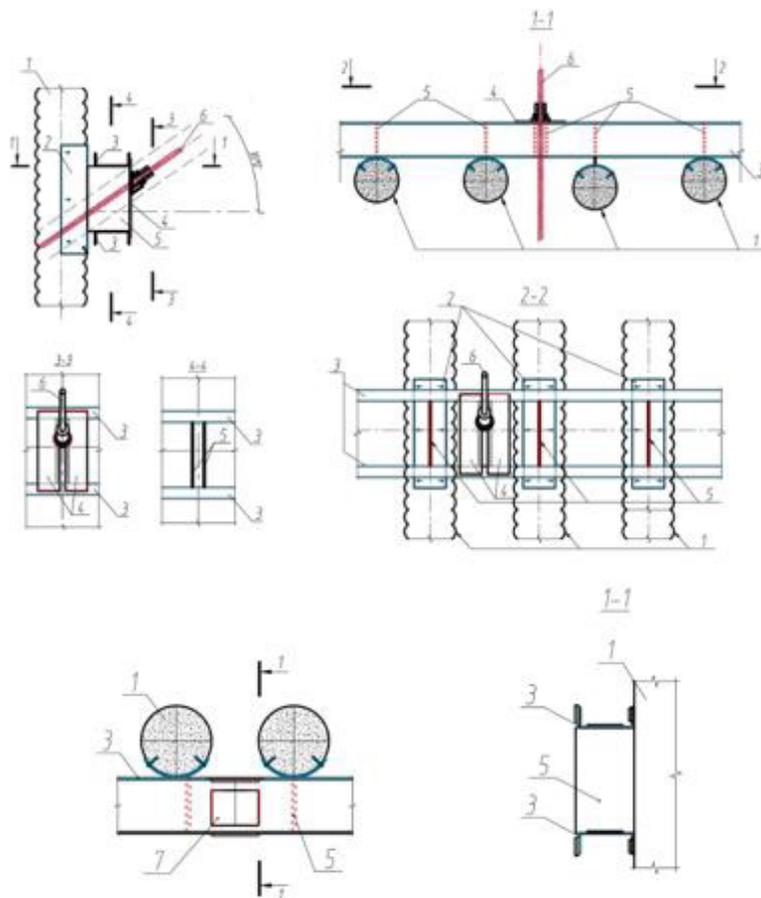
Scheme of the knot for attaching soil anchors to the strapping belt: 1-brown-ediv pile ERT; 2-stop anchor belt; 3-anchor belt made of steel profiles; 4-steel plate; 5-stiffening ribs of the anchor belt; 6-rod made of high-strength anchor belt reinforcement; 7-knot fastening of the anchor belt joint.
